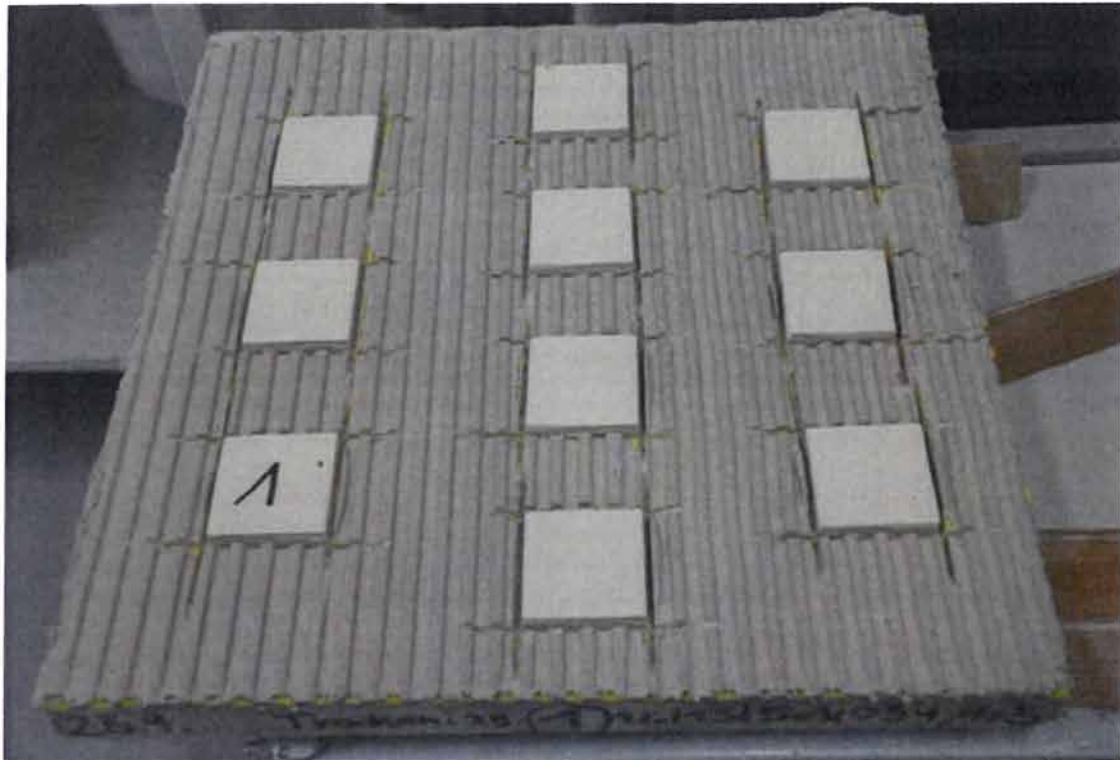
Slab with DURABASE CI++ rolled-up mat and Sopro`s No.1 flexible adhesive after dry storage
